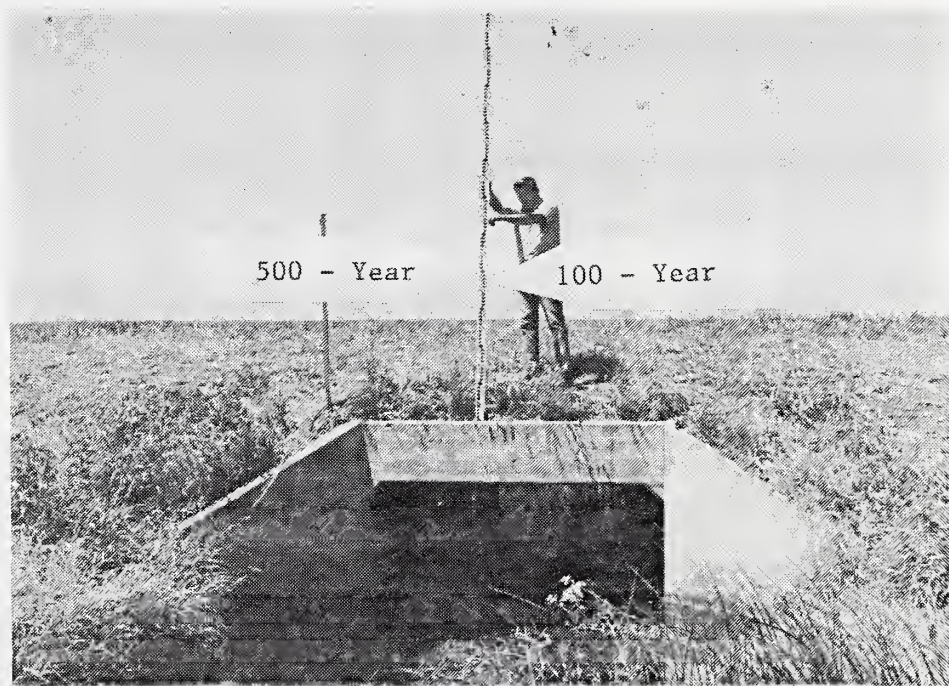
M2.72, Box Culvert (Highway 281)
